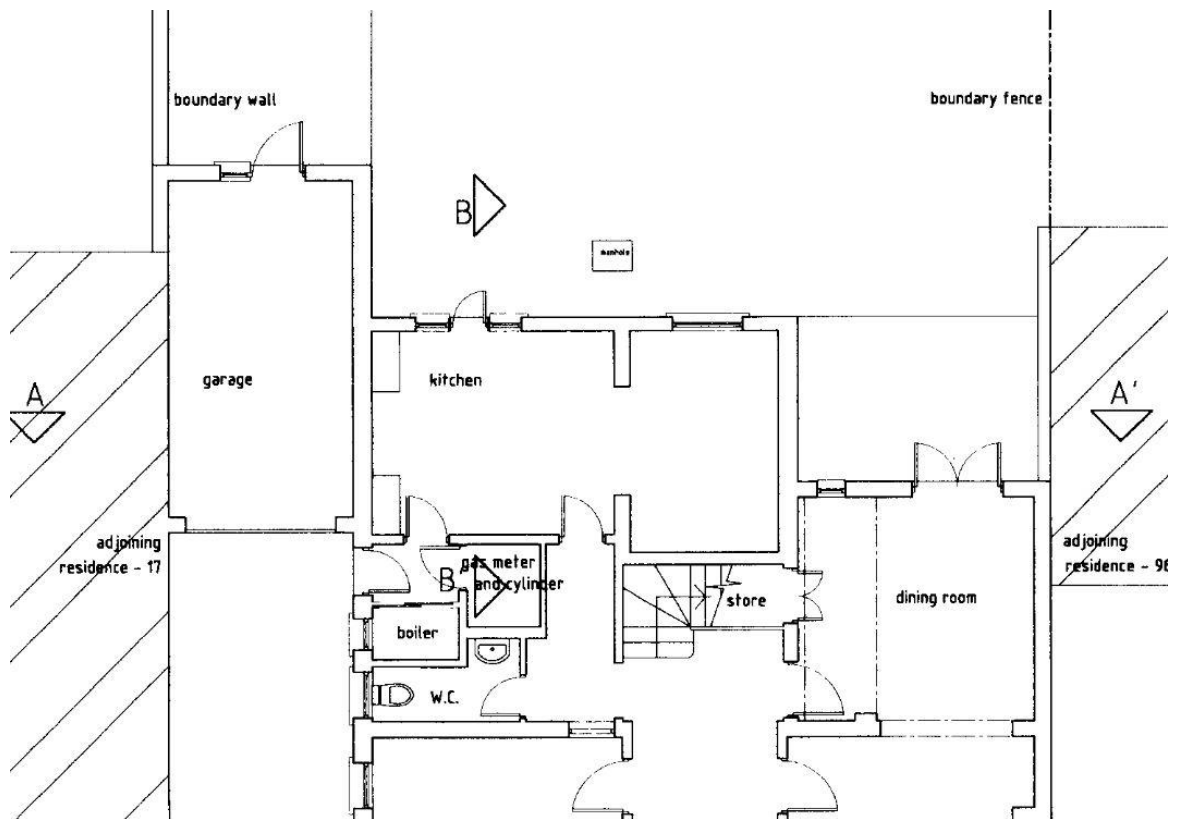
Extract of the above showing the layout of the rear part of the ground floor as existing in 1999 with the stepped rear elevation.
